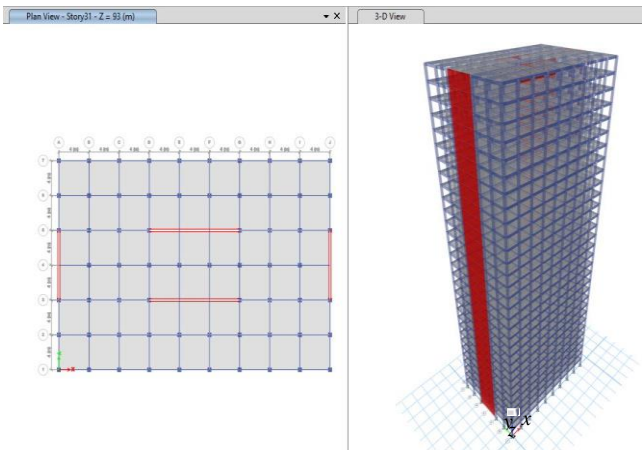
Model 7-Buildings with shear wall located at two opposite edges and center
